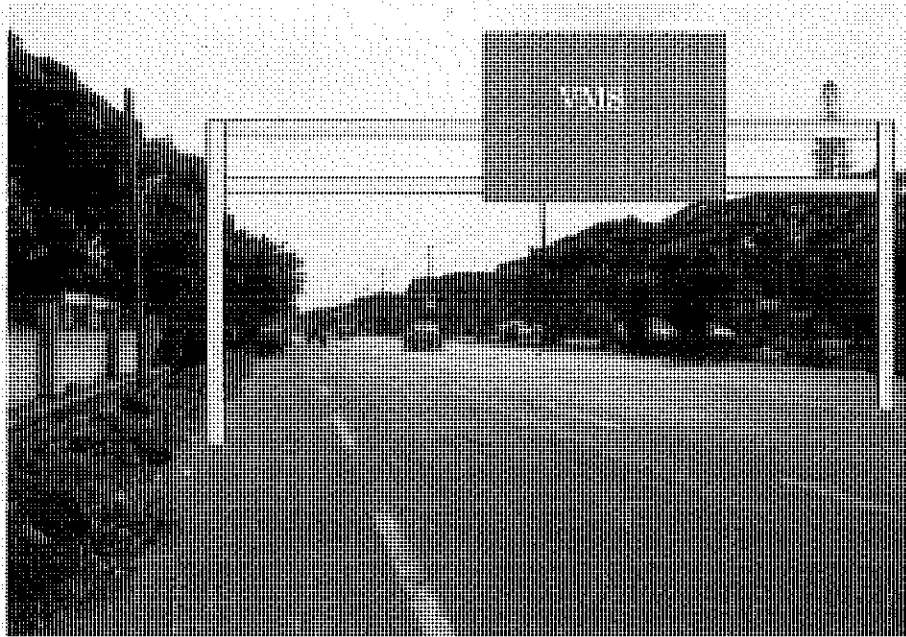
Proposed Location of VMS at Hanging Bridge
